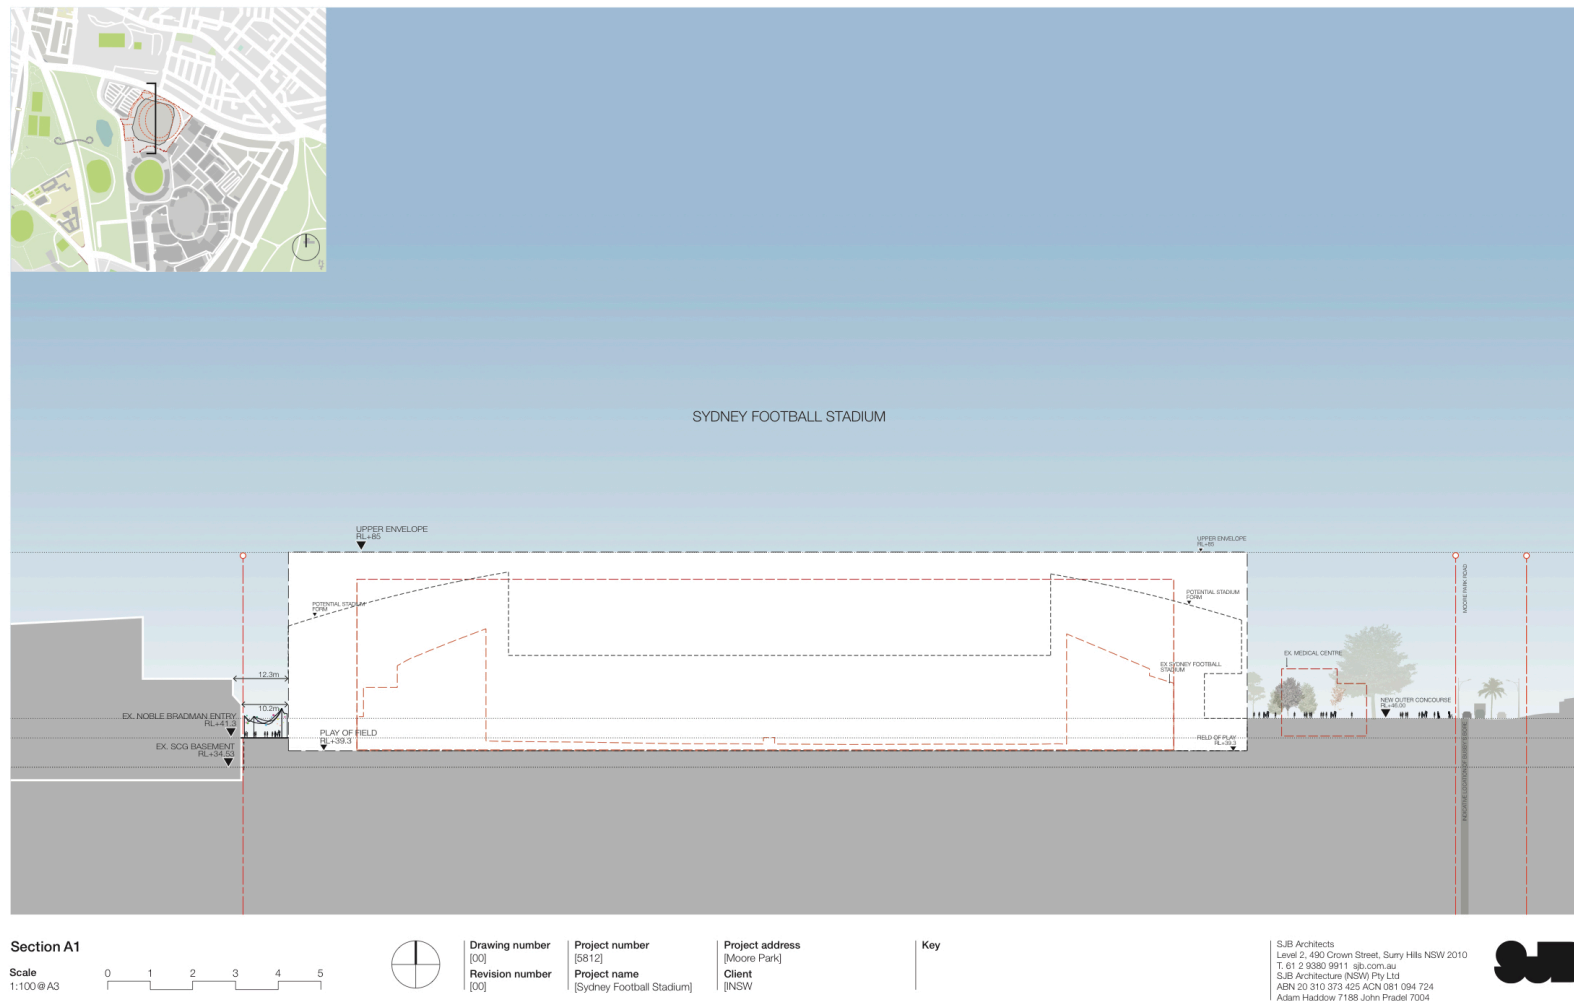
SECTION A1 (SOURCE: SJB ARCHITECTS, 2018)
